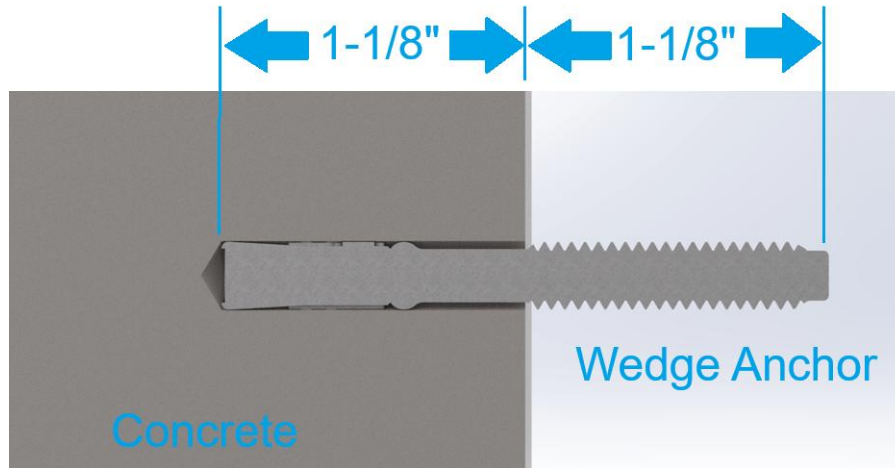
1/4" x 2-1/4" Long Wedge Anchor Threads Protruding Out of Concrete
